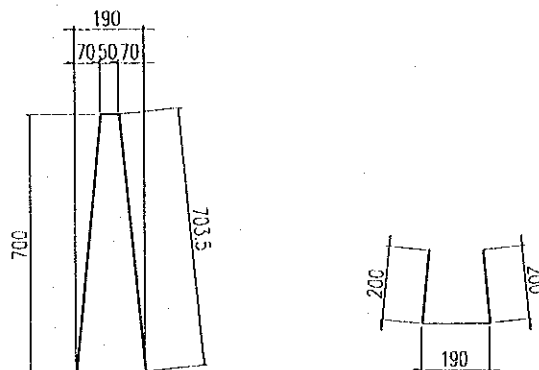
# DETAIL OF PRECAST CENTRAL RESERVE (2)
